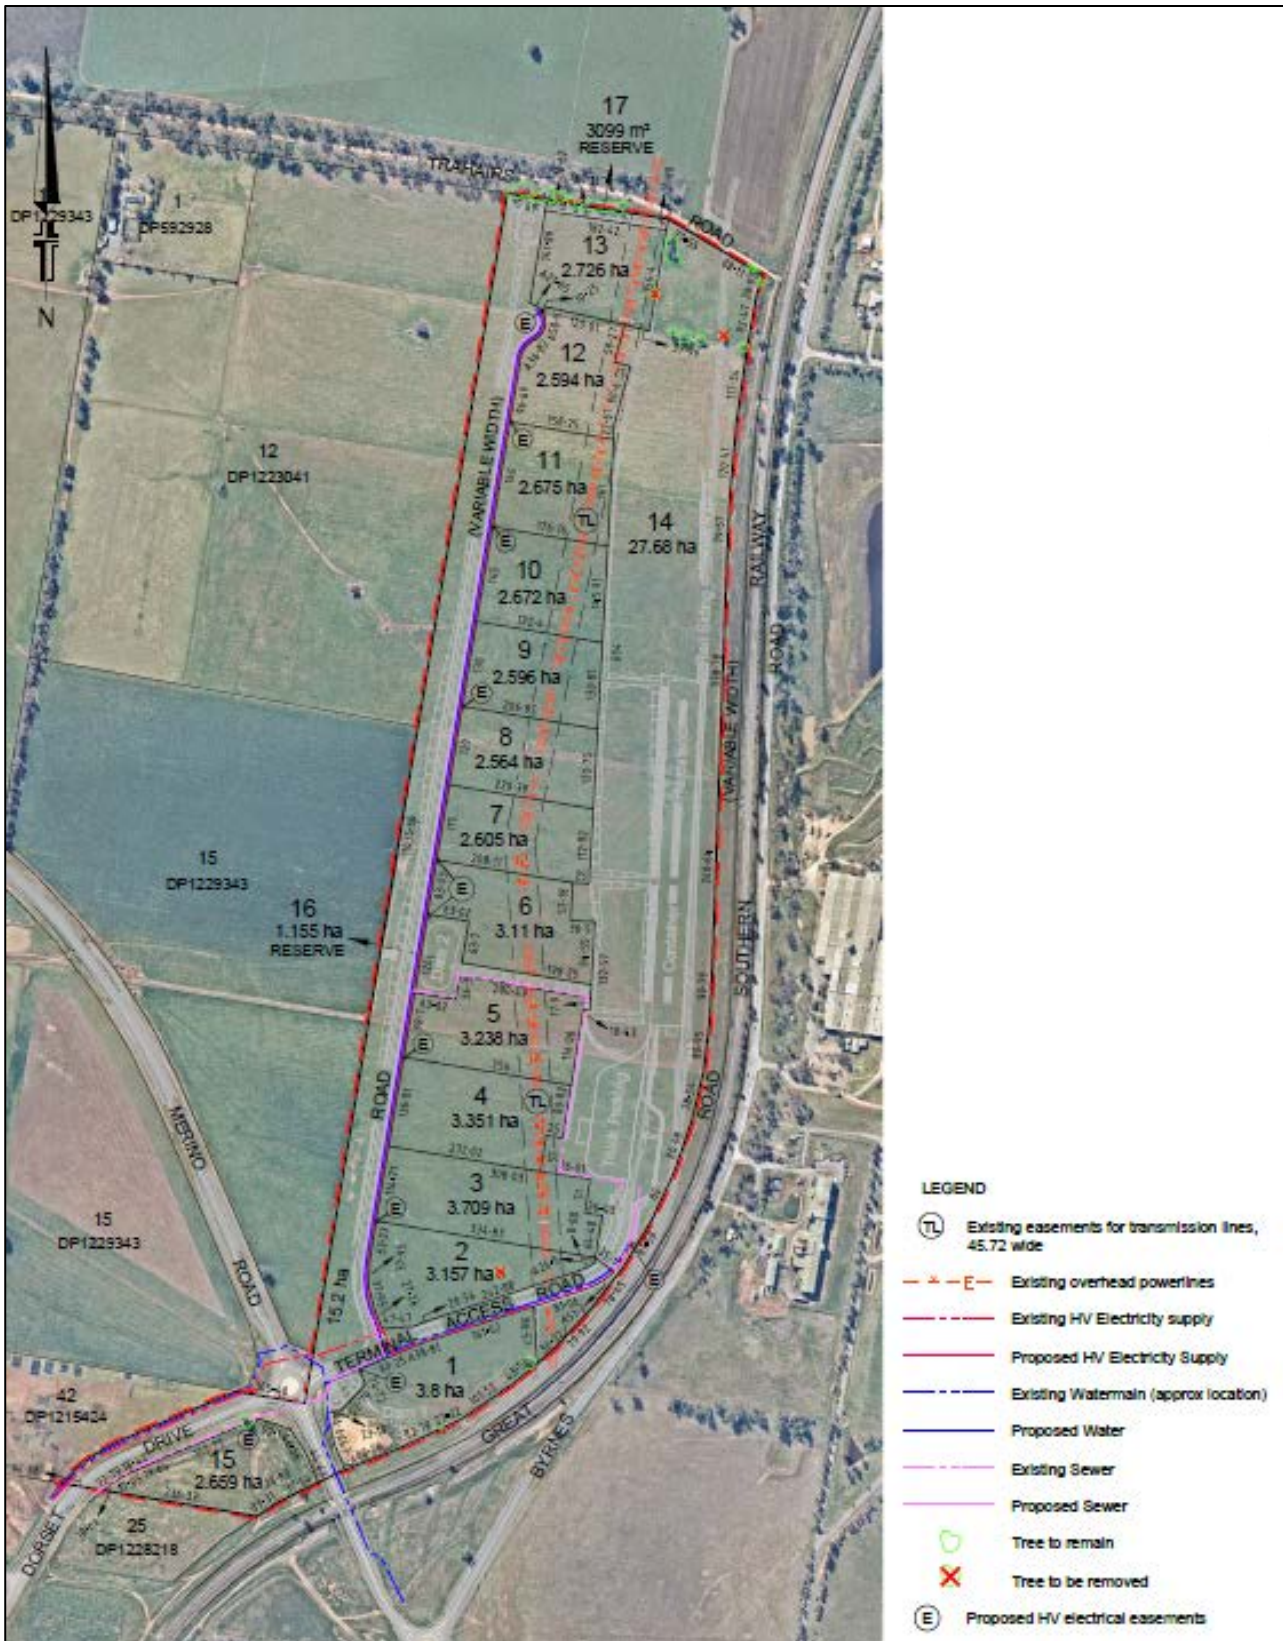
Layout of the proposed development (Source: Spiire, 2021)
